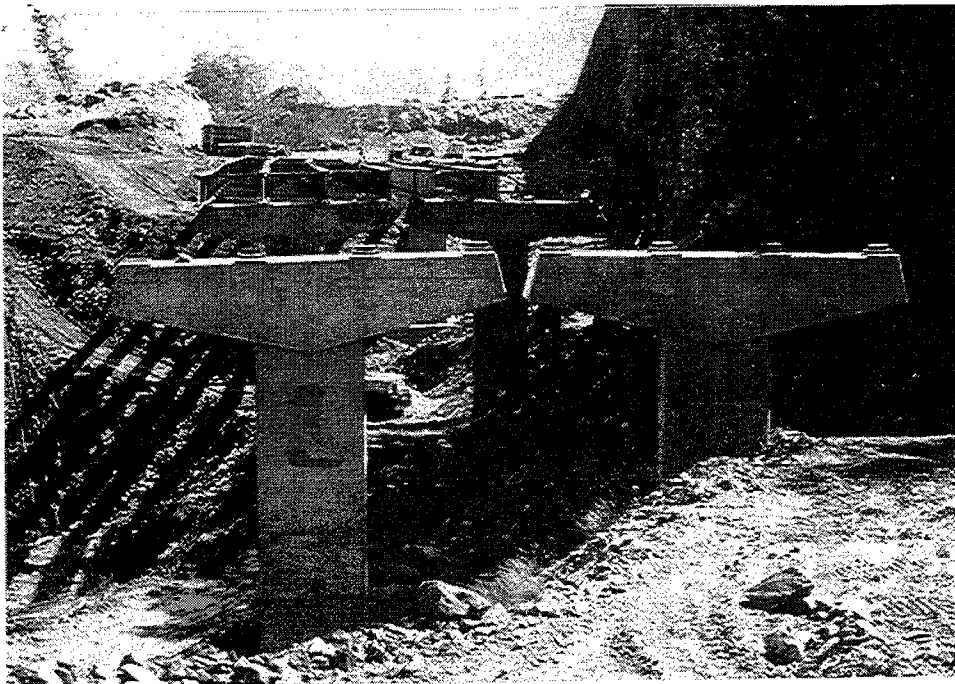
Large Steel Girder Bridges Were Constructed Over Unstable Colluvial Ravines Along the Mountainous Slopes of the Project Area.
